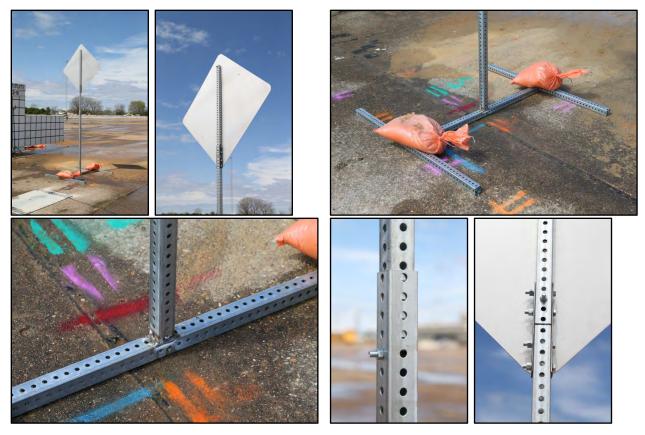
Option B Temporary Work Zone Sign Support Used for Test No. 490026-2-6.
